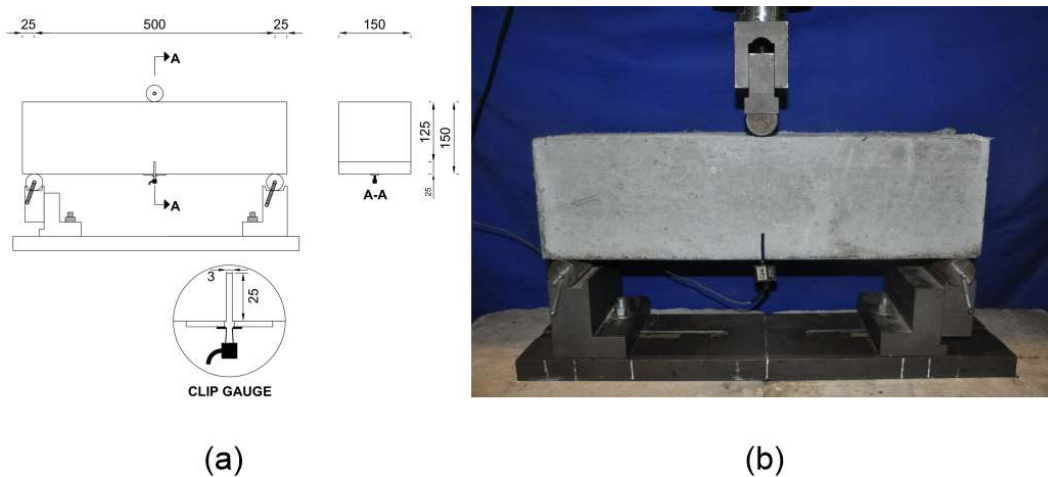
Test setup: (a) specimen dimensions for monotonic and dynamic three-point bending tests (EN 14651 [29]) and (b) setup image. Dimensions in mm
